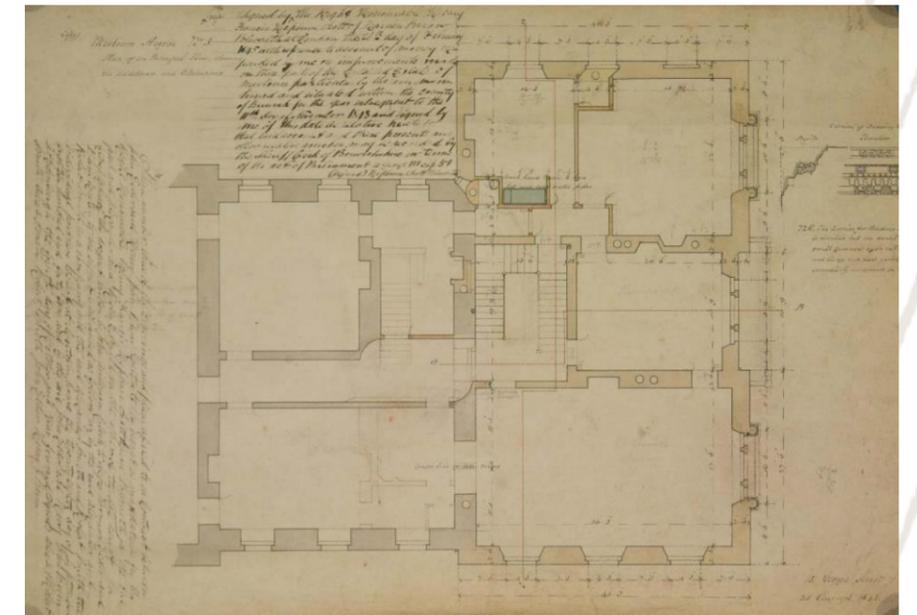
Principal Floor Proposed Plan illustrating addition of new wing, 1843, Burn and Bryce
